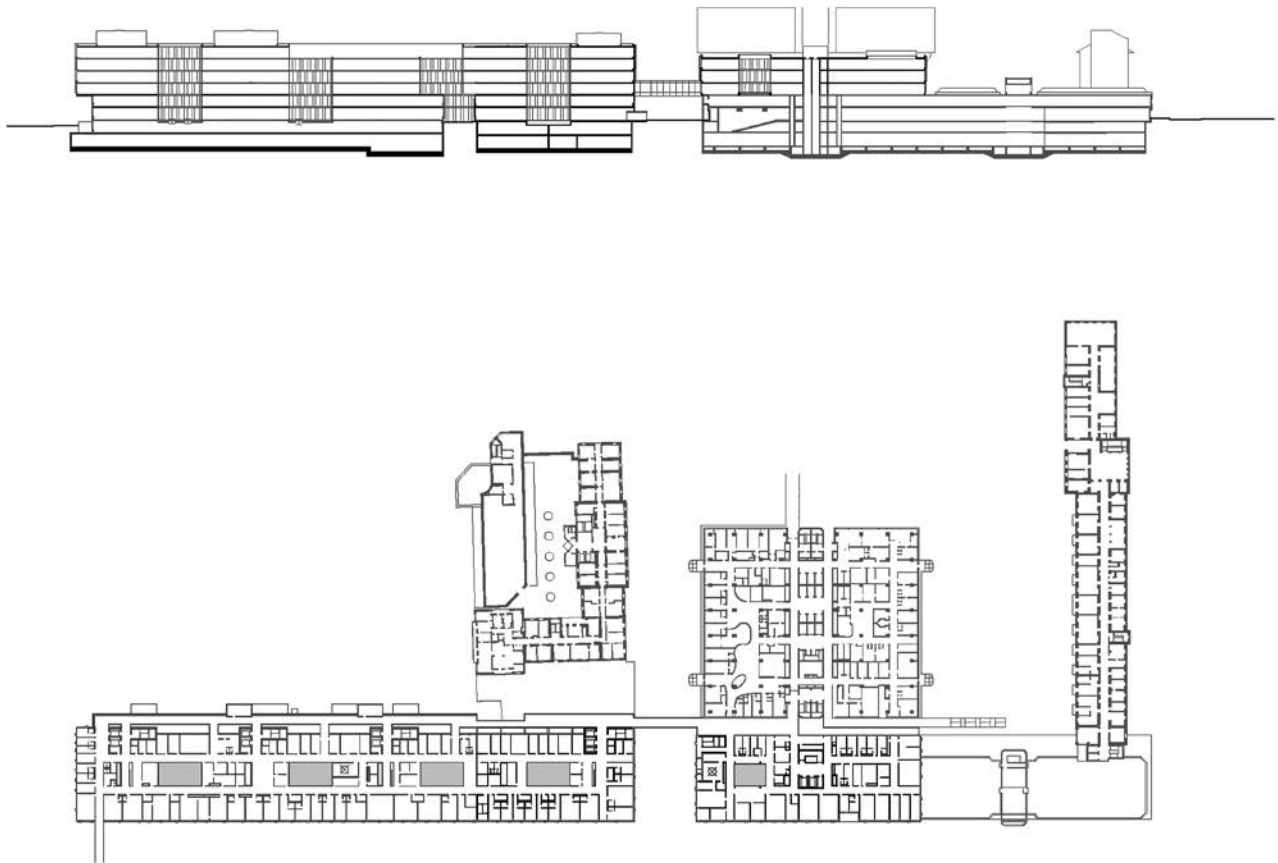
Section through addition and second floor plan (bridge level). Source: Nickl & Partner Architekten AG
